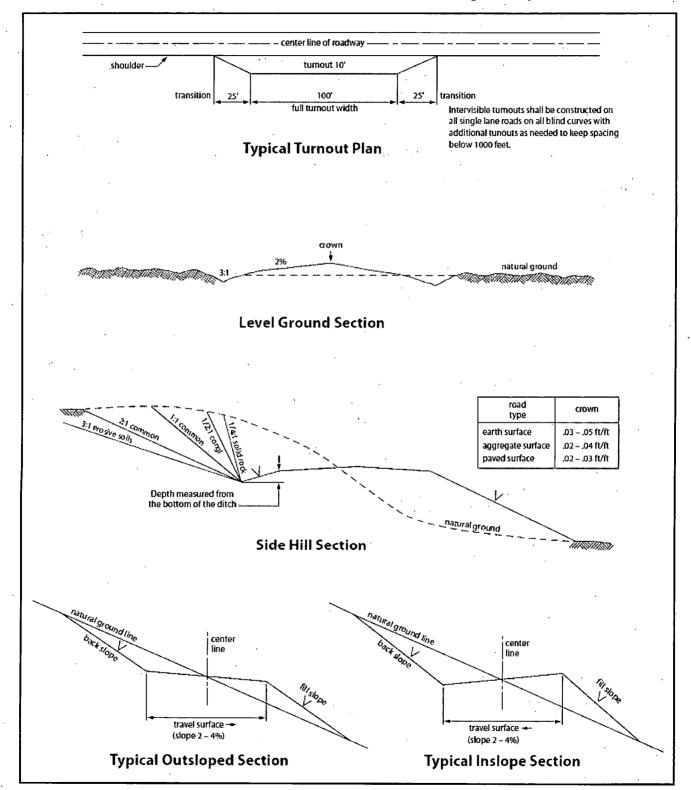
Cross-sections and plans for typical road sections representative of BLM resource or FS local and higher-class roads.
